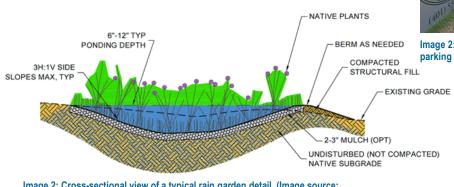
Cross-sectional view of a typical rain garden detail. (Image source: http://www.5counties.org/docs/lu_planning/04_rain_garden.pdf
